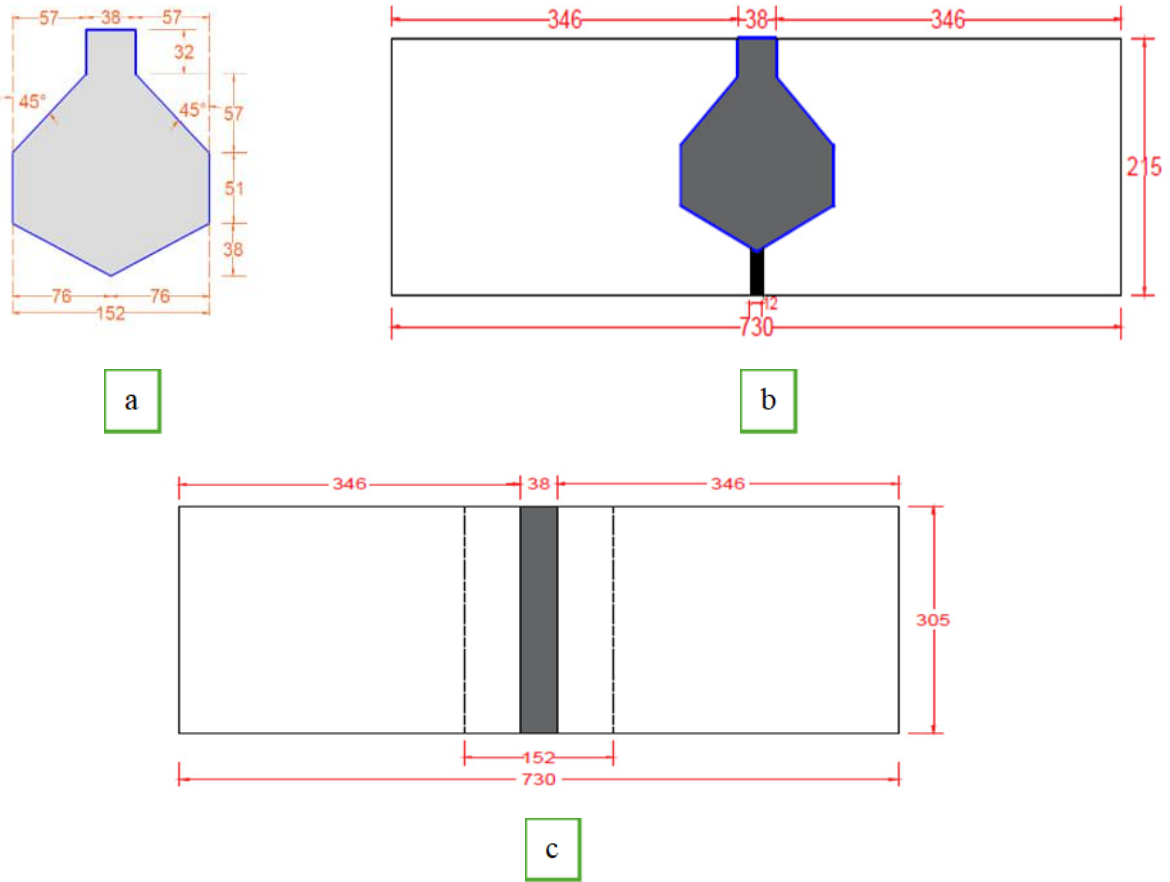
Primary shear-key specimen geometry (a) shear key detail; (b) side view; (c) top view
